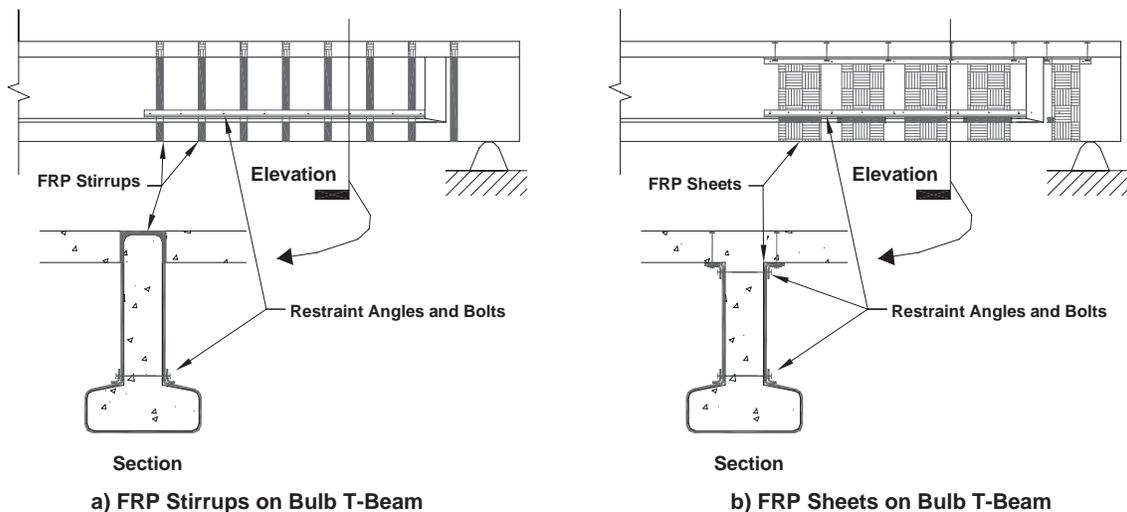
Typical shear strengthening of AASHTO-type girder bridge
